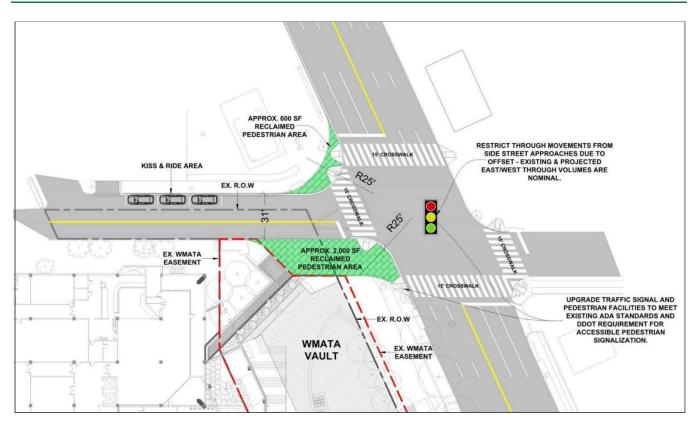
Gorove Slade 2011 Campus Plan Recommendation for Connecticut Avenue and Veazey Terrace
